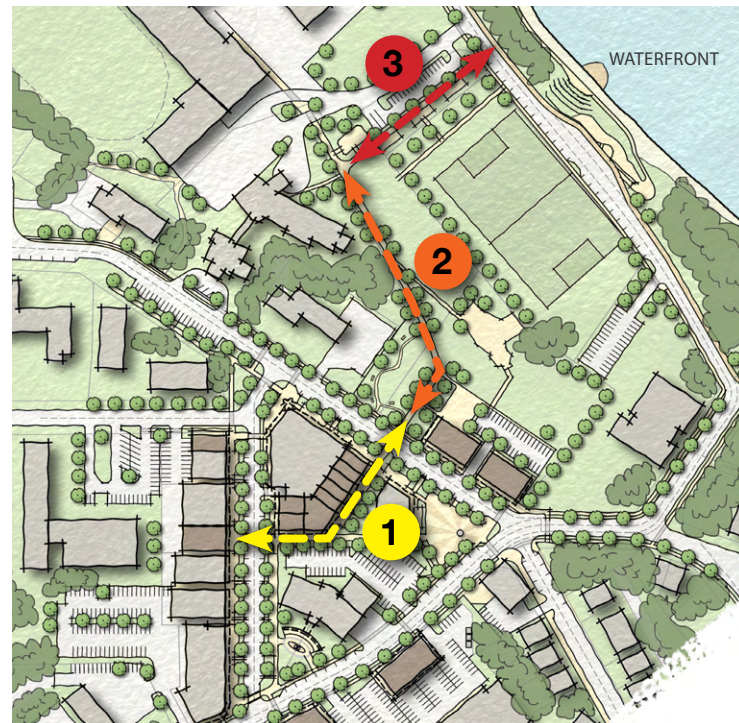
Downtown to Waterfront Pathway Spine Concept Plan. Source: Fotenn
